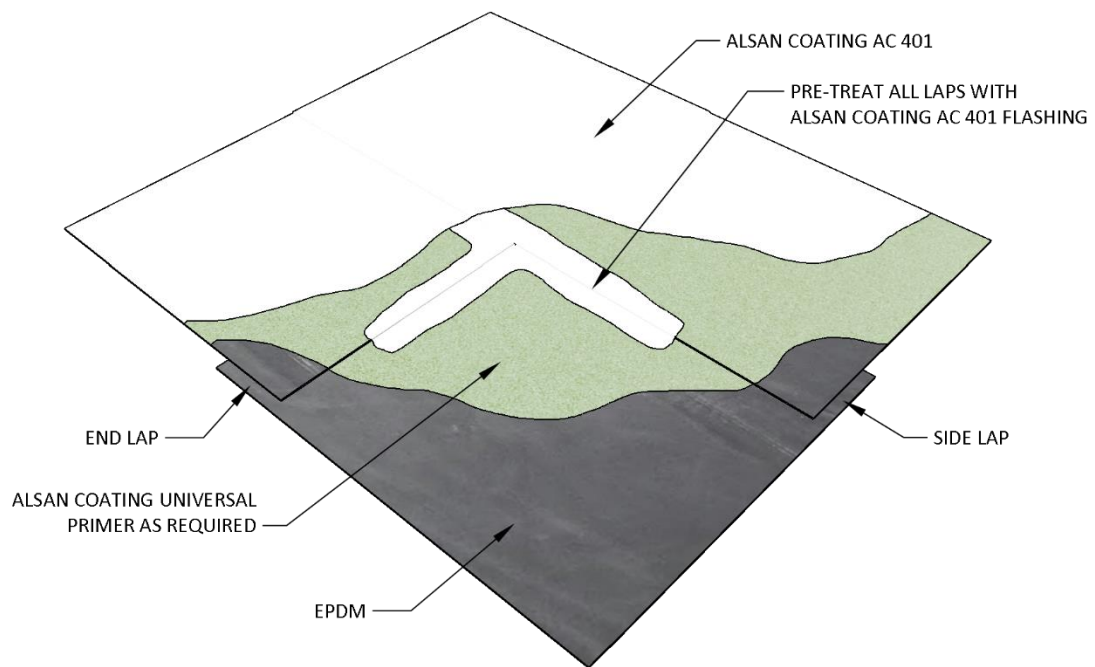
Acrylic Roof Coating Over EPDM, Side/End Laps
